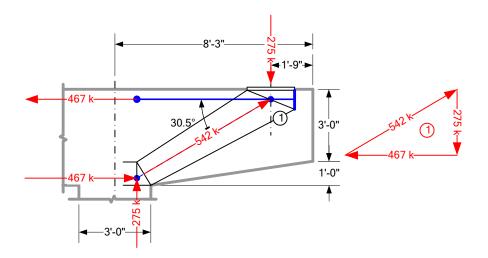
Strut and Tie model for Pier 7 (HS-20 forces shown)
